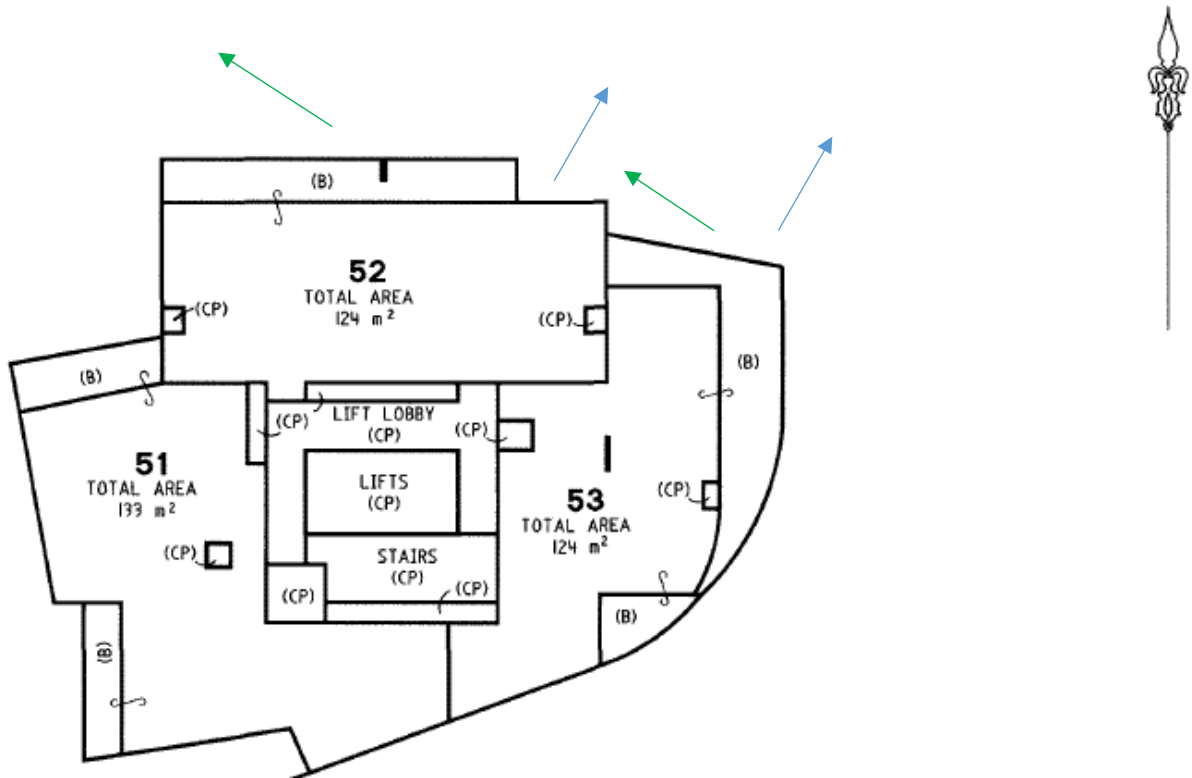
Strata Plan layout of Level 12, at 417-419 Bourke Street, Surry Hills
